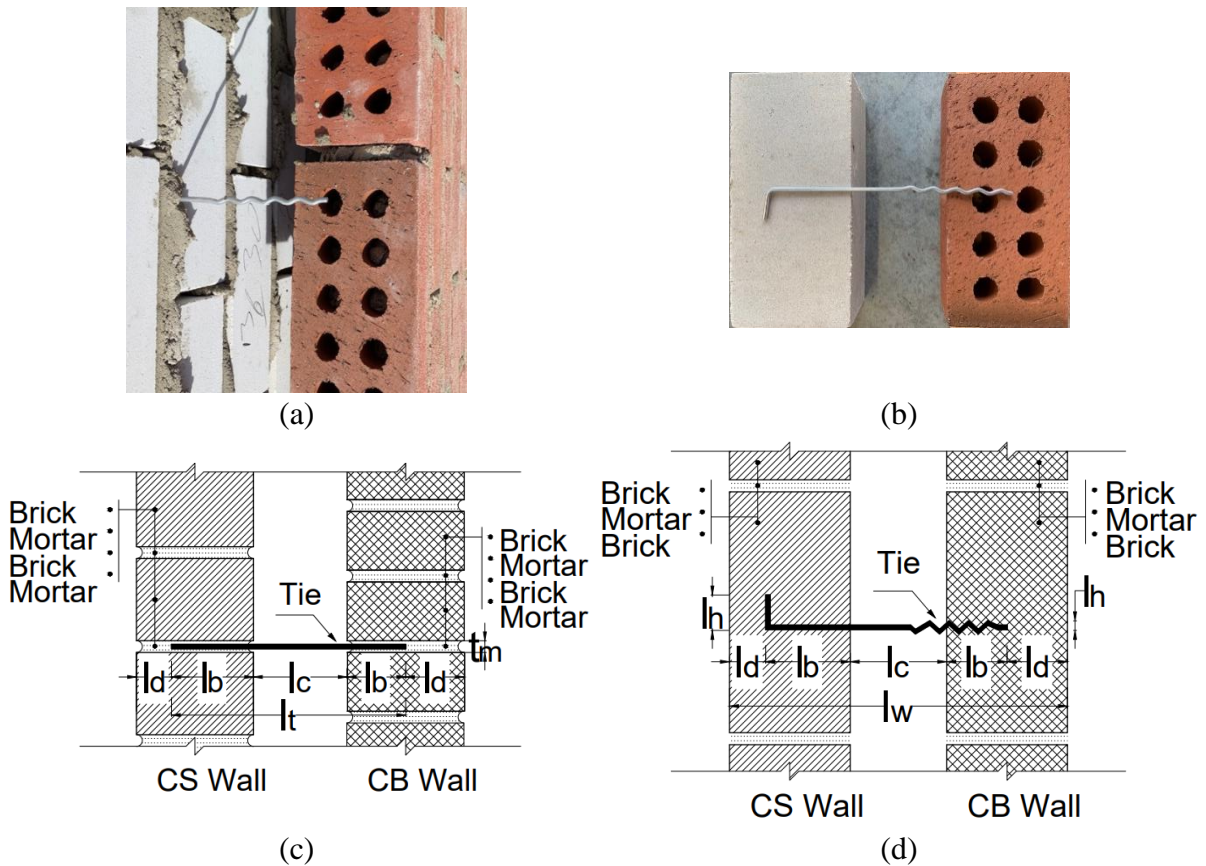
Connection details in cavity walls: tie embedded in CS (a), cavity wall tie (b), cavity wall side view (c), and cavity wall plan view (d).
